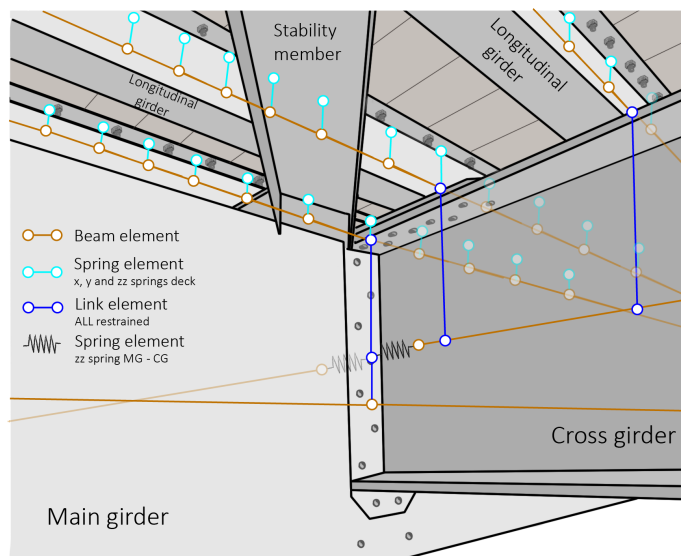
Type of connection between elements in the model (3D view under the bridge). The deck bracing connections and beam elements for deck boards were not shown for the sake of clarity in the figure.
